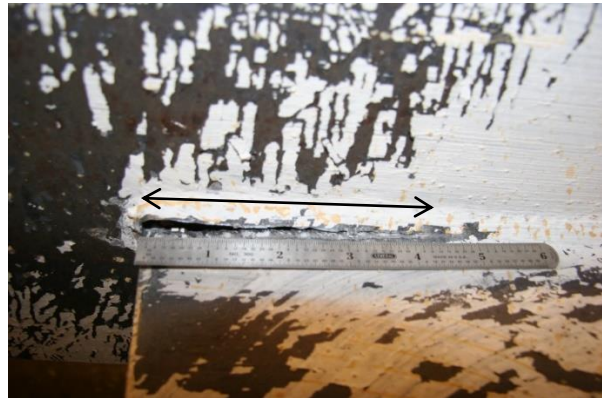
NE gusset weld crack @ +2.5%
